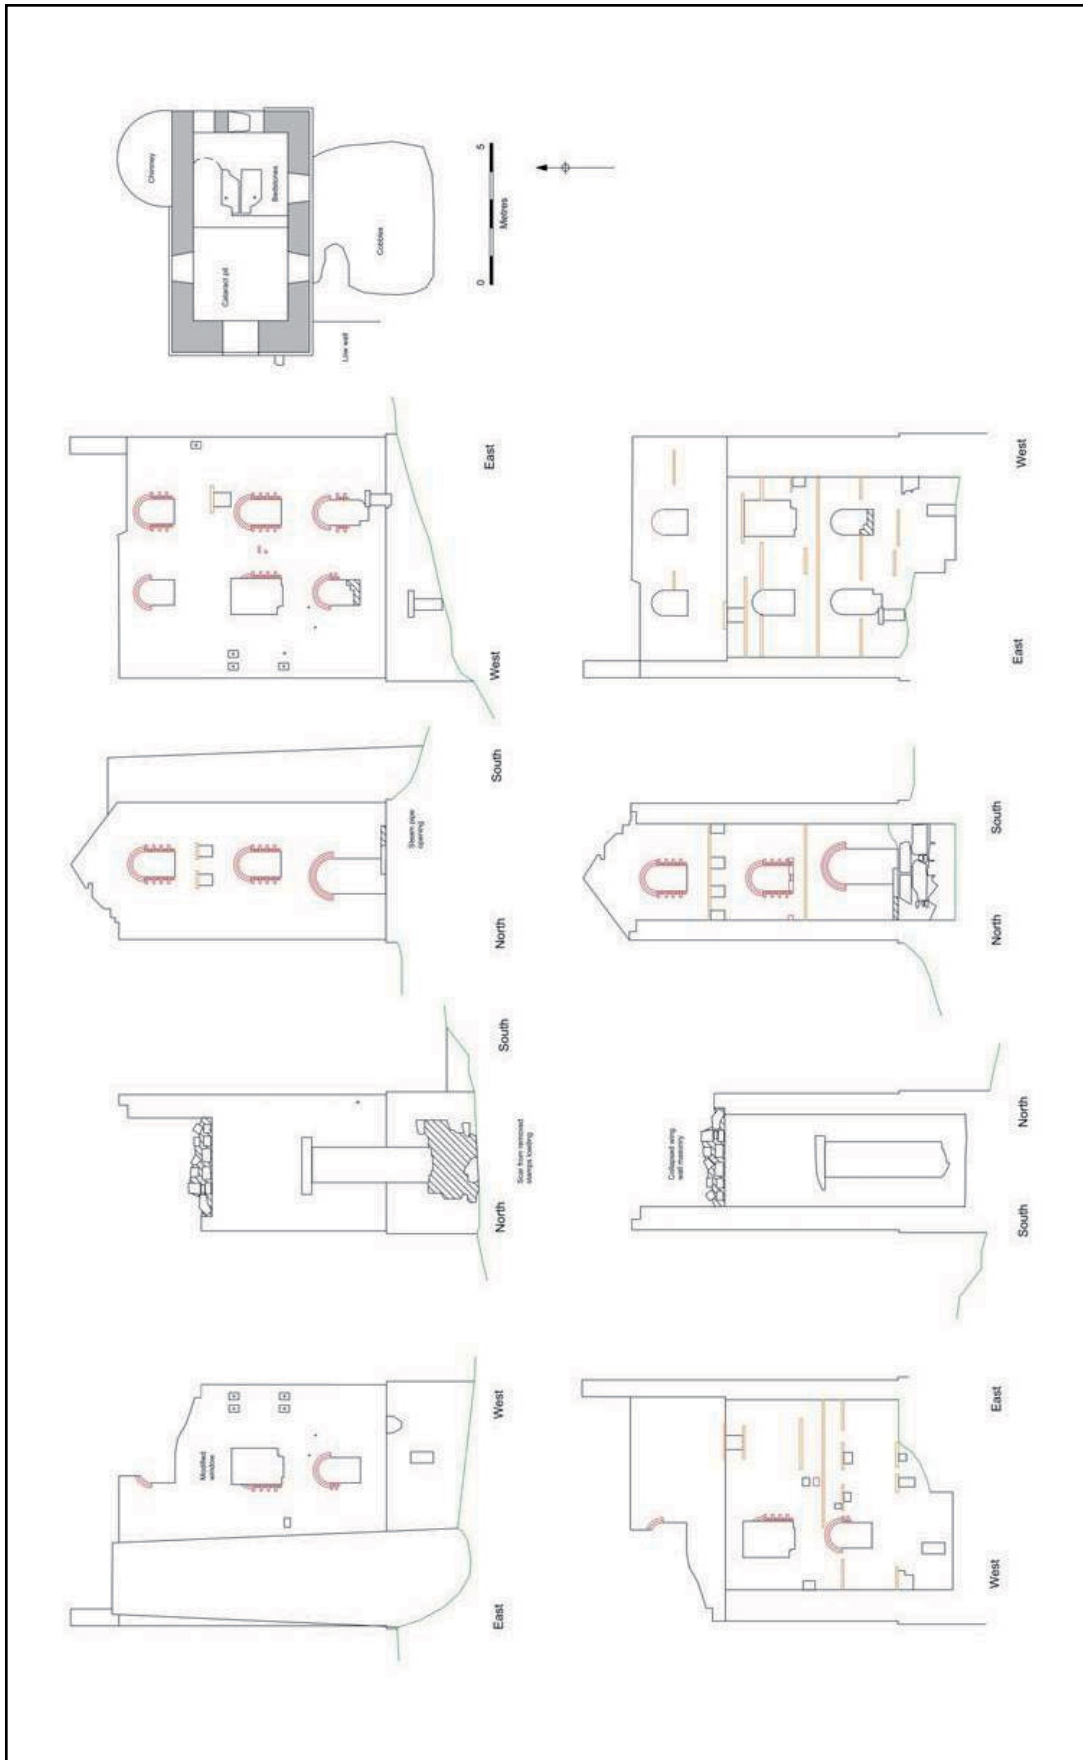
Plan, external and internal elevations of Wheal Coates stamps engine house.
